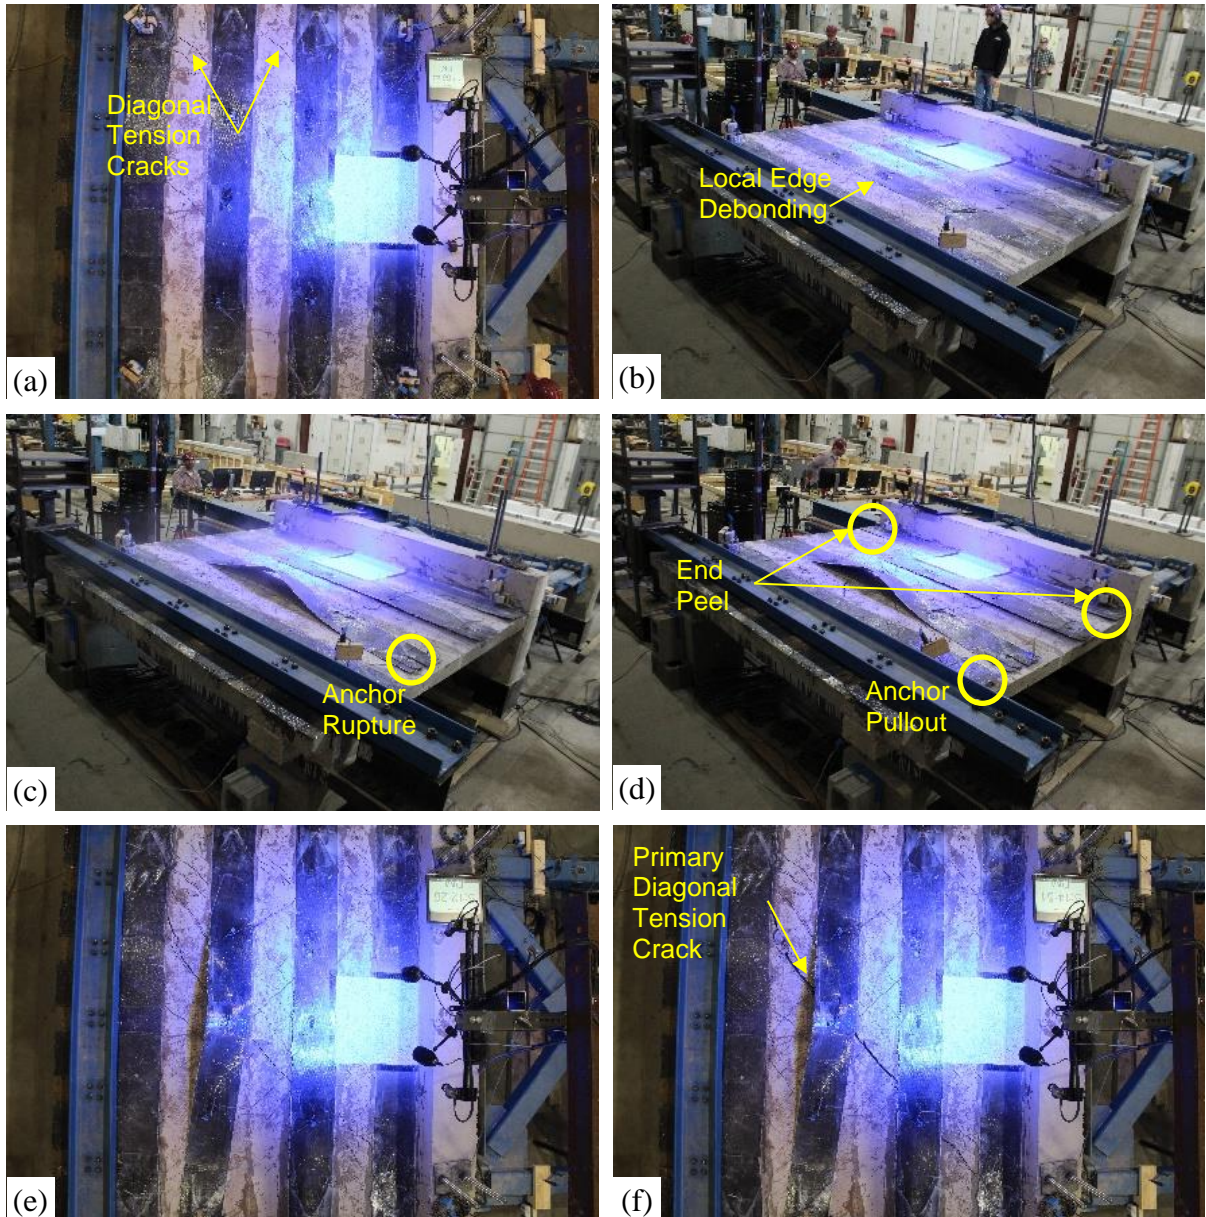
Failure Progression of Specimen CD2: (a) First Diagonal Tension Cracks at 125 kips; (b) Localized Edge Debonding of Sheet S3 at 266 kips; (c) Anchor Rupture and Debonding of Sheet S3 at 280 kips; (d) Anchor Pullout and End Peeling at -233 kips; (e) Condition After Debonding at 159 kips; (f) Final Condition of Failed Specimen at 111 kips.
